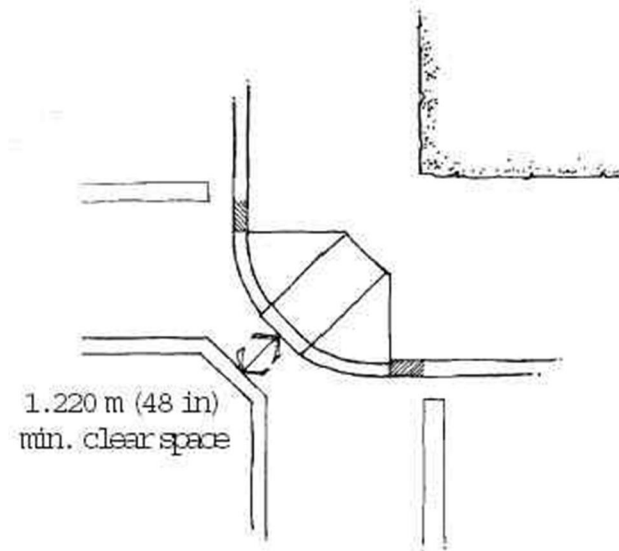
If diagonal curb ramps are installed, a 1.220-m (48-in) clear space should be provided to allow wheelchair users enough room to maneuver into the crosswalk.
